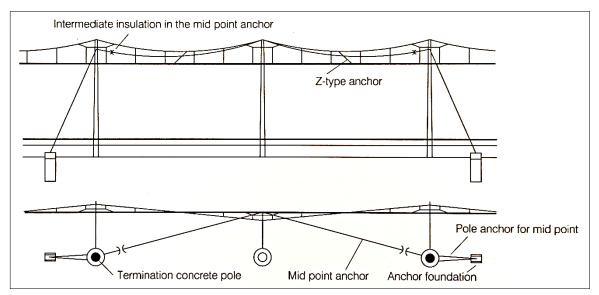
Layout of mid-point anchor in an open section. (Kiessling 2009)
